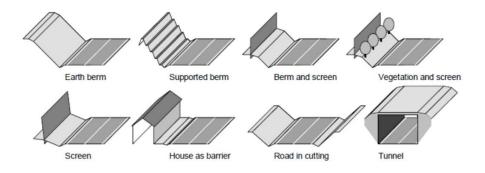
Examples of noise barrier wall shapes (CEDR, 2017)
